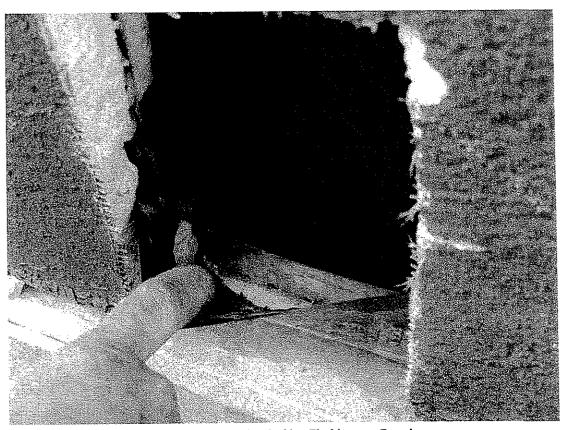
Wall Appears to be Flashed Properly—Rubber Flashing was Found
